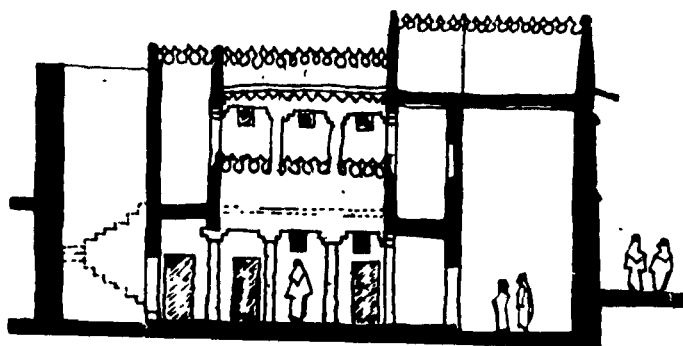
High Roof Parapets (Source: Bahammam, 1987)
